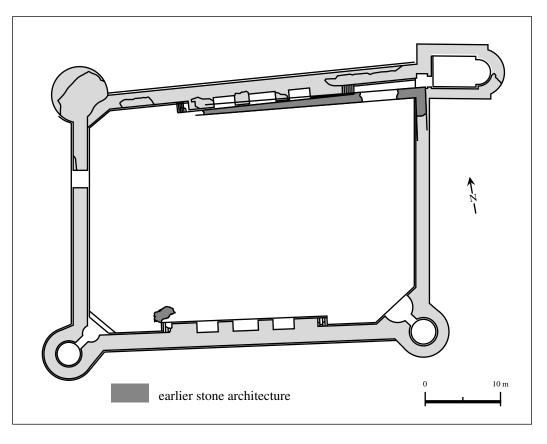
Plan of Early Byzantine castellum with earlier stone architecture
